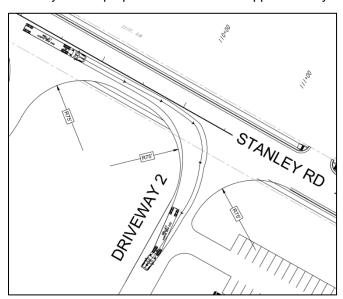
Stanley Road at Driveway 2 – Eastbound Right (Entering Truck)
